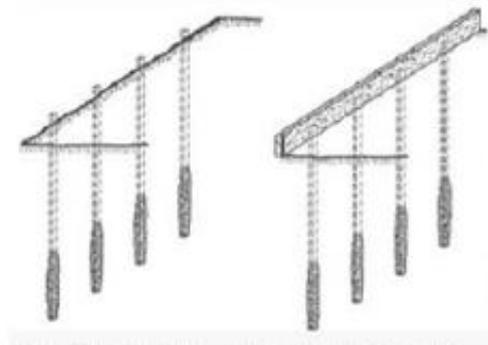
Micropiles and crown beam (Pinto A., 2010, *Retaining walls and structures. Discipline of Excavations and Underground Works. Instituto Superior Técnico*)
